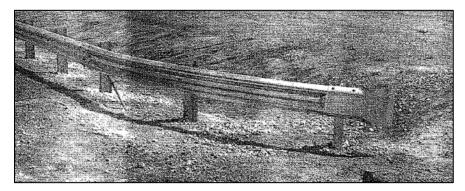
Vermont W-Beam Guardrail Terminal (2).
